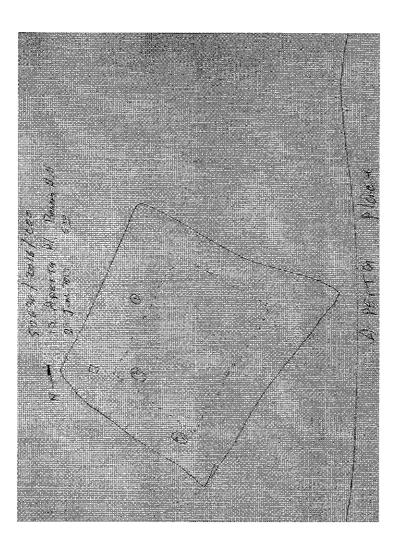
Site Plan Showing Location of Samples Taken and Approximate Extent of any Loose-fill Asbestos Insulation
